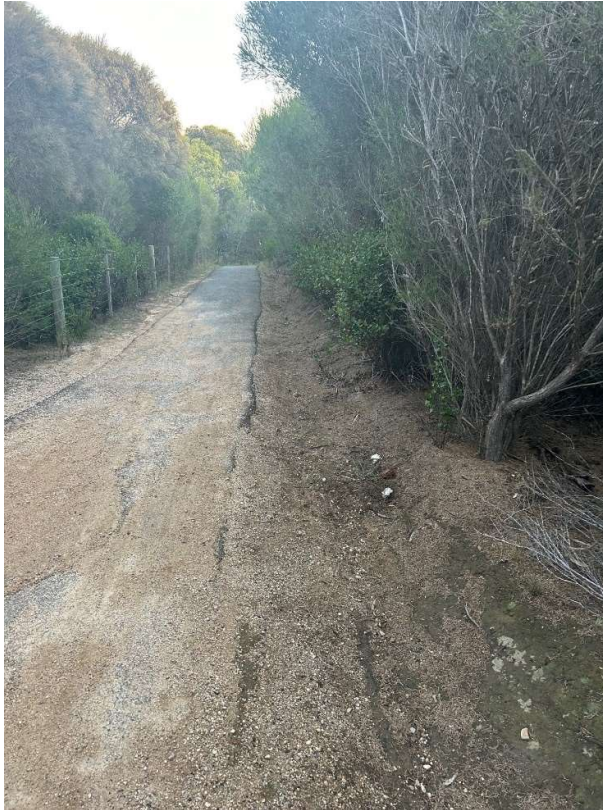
Photos external to the east side of site of existing erosion from runoff from site
